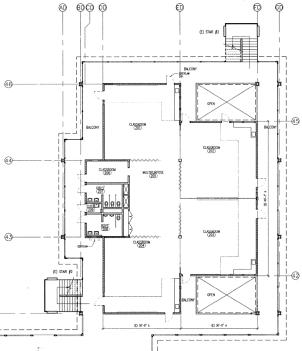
BUILDING 4: 1998 Modernization 2nd Floor Plan
